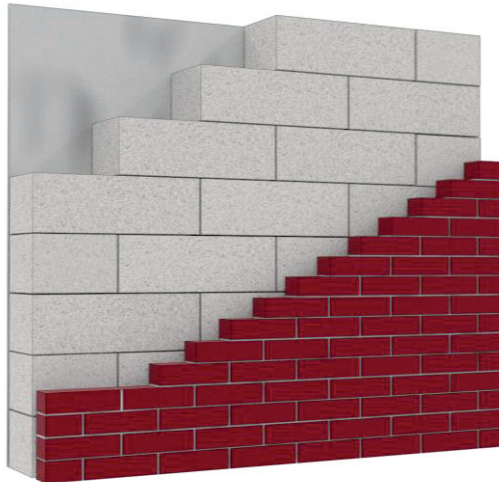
Schematic of a masonry cavity wall with brick veneer as the outer leaf and autoclaved aerated concrete (AAC) as the inner leaf (total thickness of ~ 345 mm). Layers from the right side (exterior): brick masonry veneer (120 mm), air gap (10 mm), AAC (200 mm), and gypsum board (16 mm) [150]
